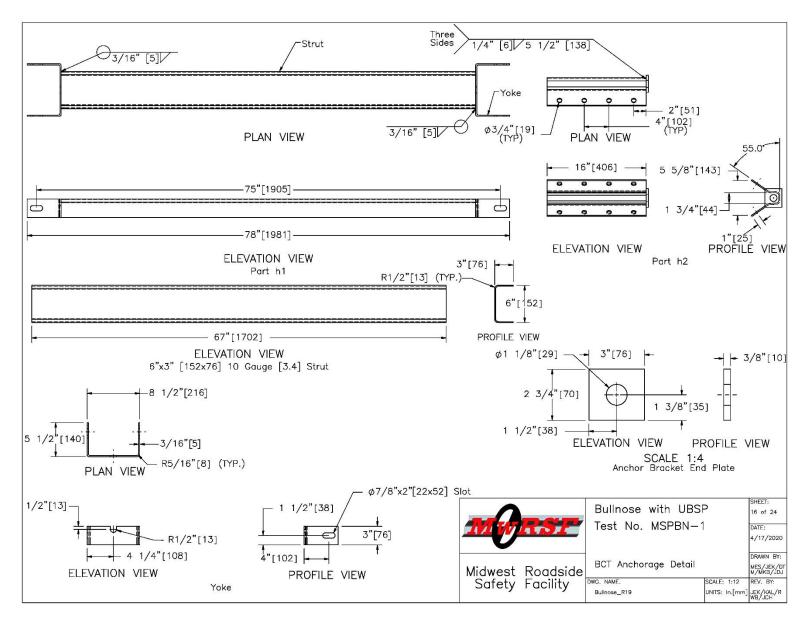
BCT Anchorage Detail, Test Nos. MSPBN-1 through MSPBN-3
